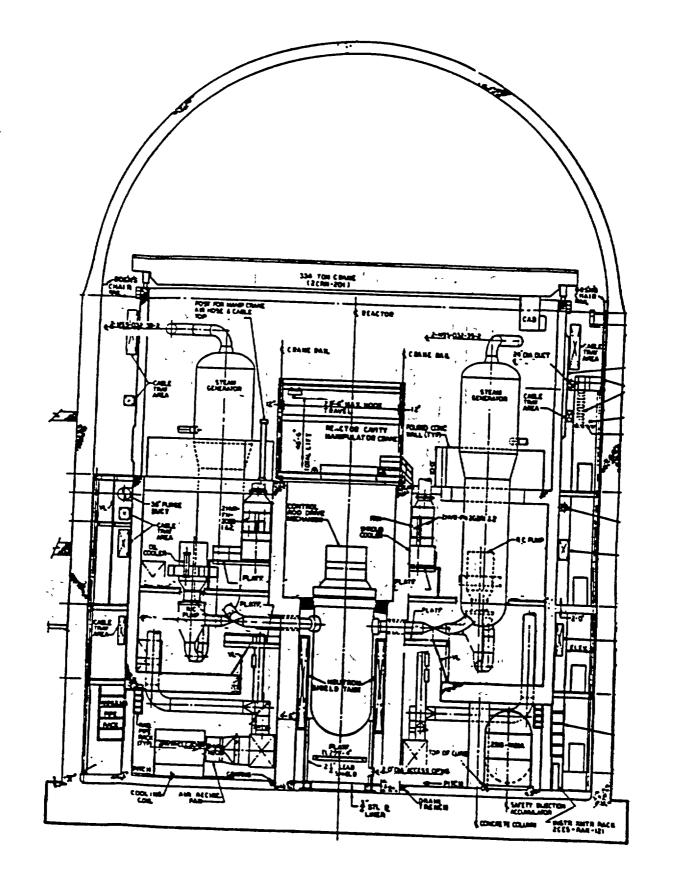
Section View of the H.B. Robinson Large, Dry Containment (1-D Post-Tensioned Concrete)
